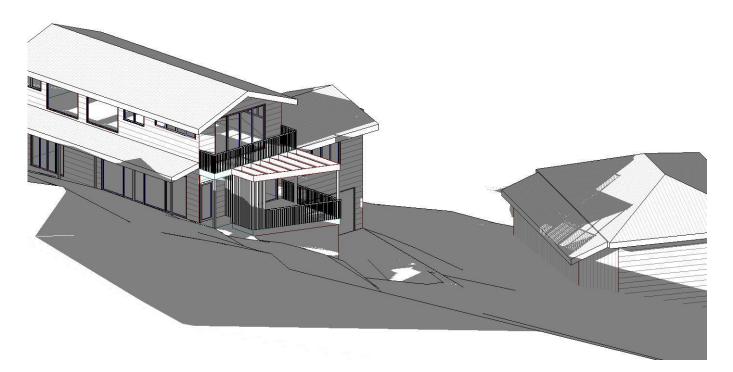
Parametric shadow details, viewing south - 21 June, 9am
